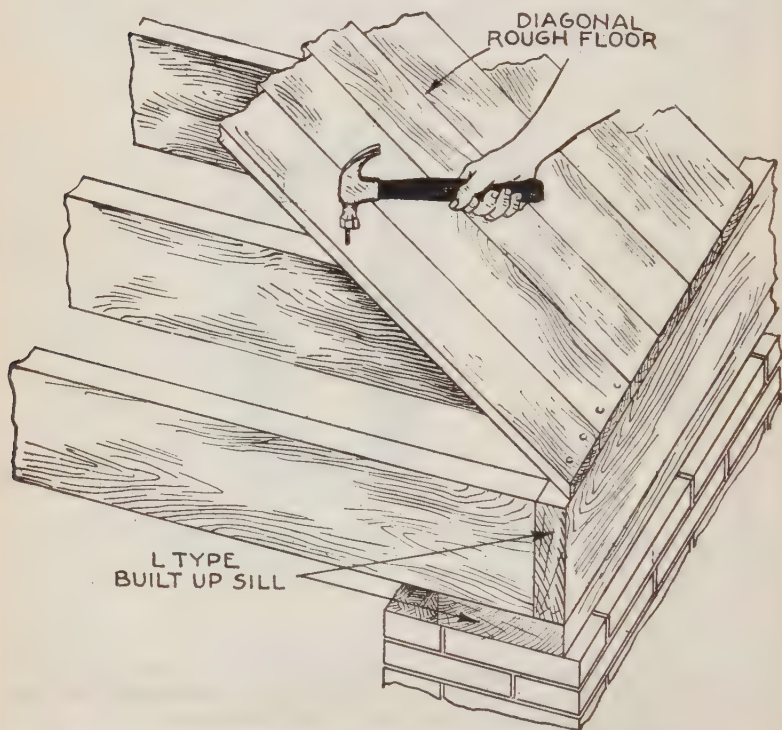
,839.—Diagonal rough floor being permanently laid before erecting wall framework. The type sill here used not only permits but requires that the rough floor be permanently laid at this stage of the work, because the studding shoe rests on top of it.
